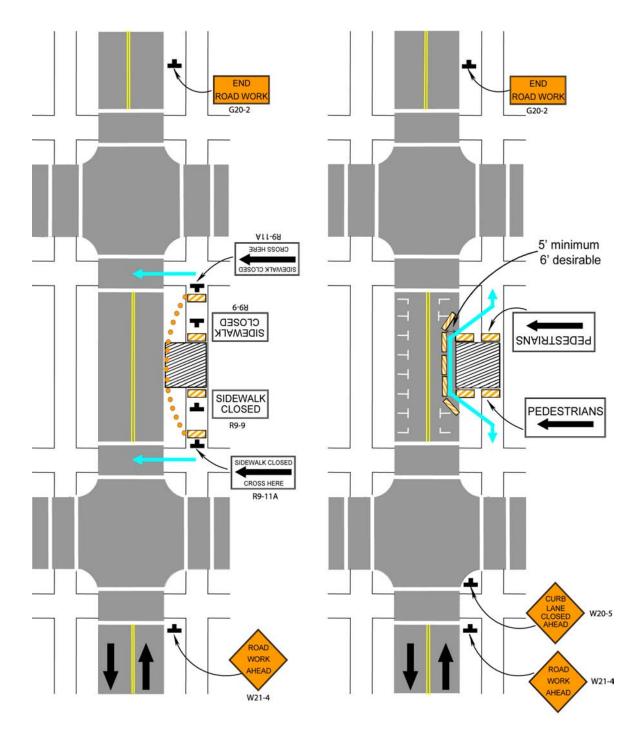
Typical Application: Sidewalk Closure and Bypass Sidewalk Operation
